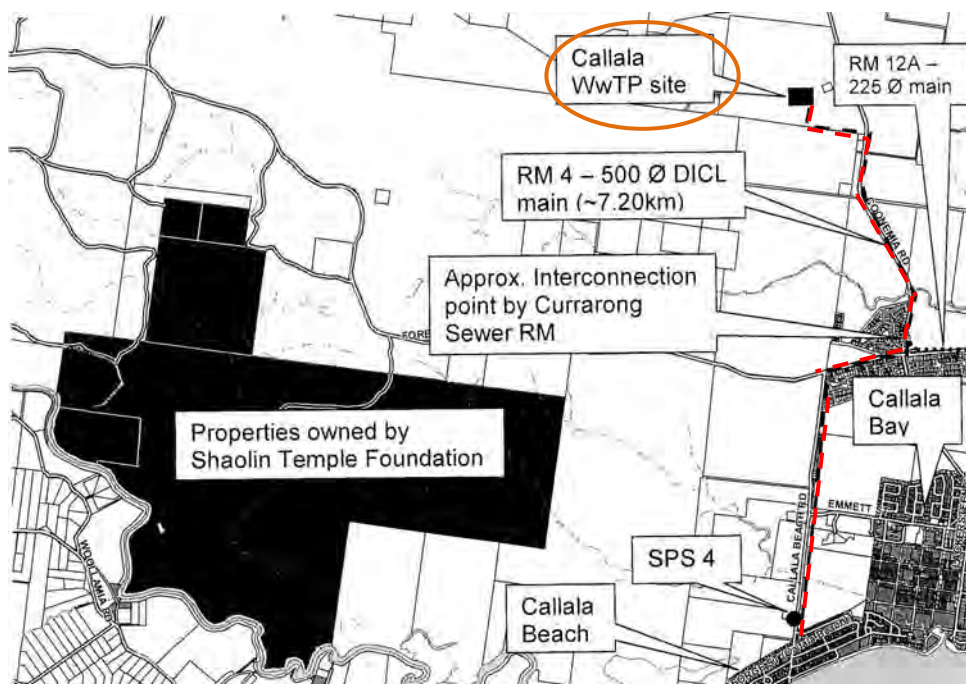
Existing sewer infrastructure (source: Shoalhaven Water)
